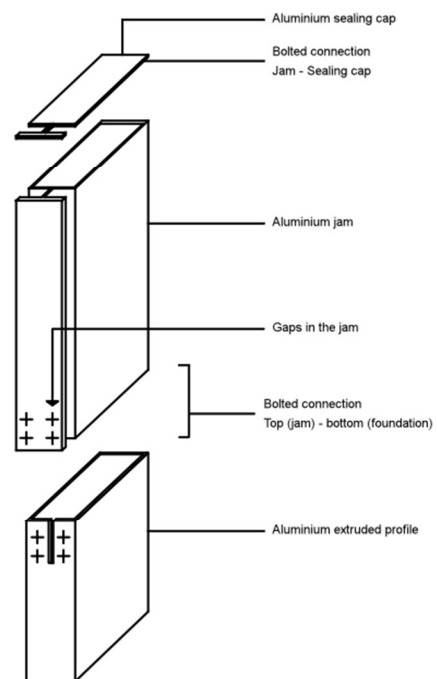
Design 1, Aluminium top + Aluminium bottom element
